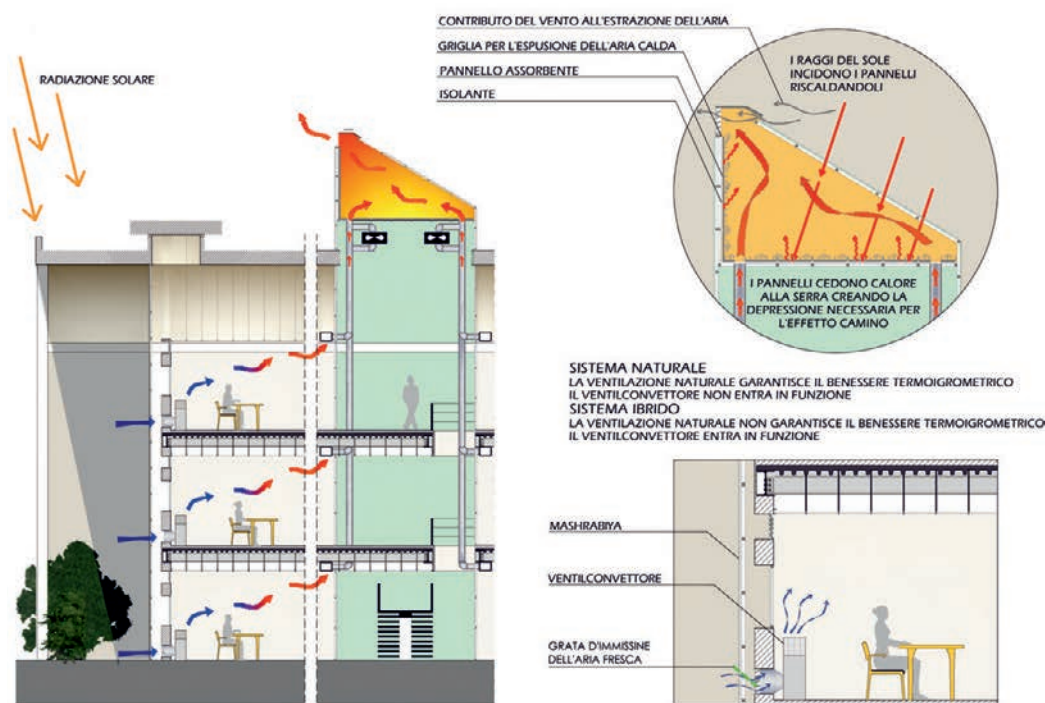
Integrated solar greenhouse system and fan coil system inside one of the Ajovalasit Pavilions built with a reinforced concrete structure (students: F. Celestra, M. Maranto and I. Trapani, 2008).
